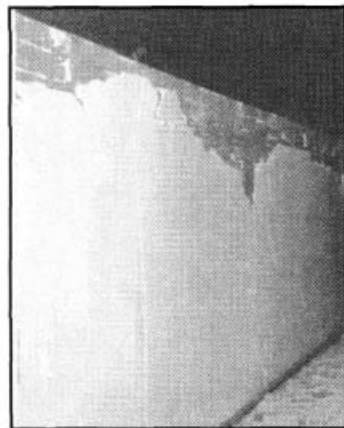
Horizontal cracking in the upper section of the second story wall at the Andres Pico Adobe.
